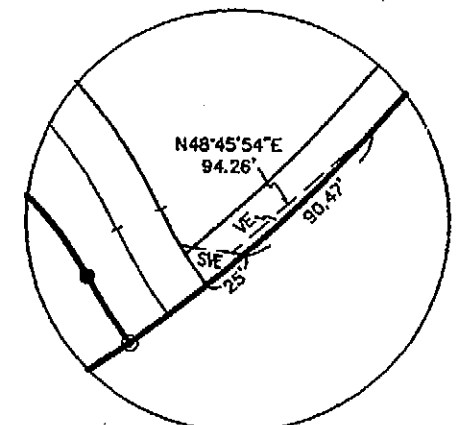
DETAIL OF SIDEWALK & VISIBILITY EASEMENT AT STREET INTERSECTION (TYP.) (Not to Scale)
